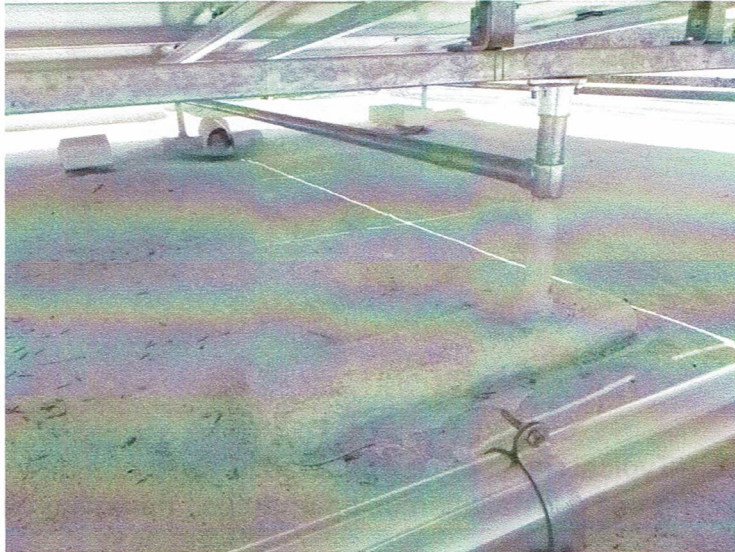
Typical solar panel installation with approved 8 inch spacing between the lowest part of the solar frame material and the roof elevation
